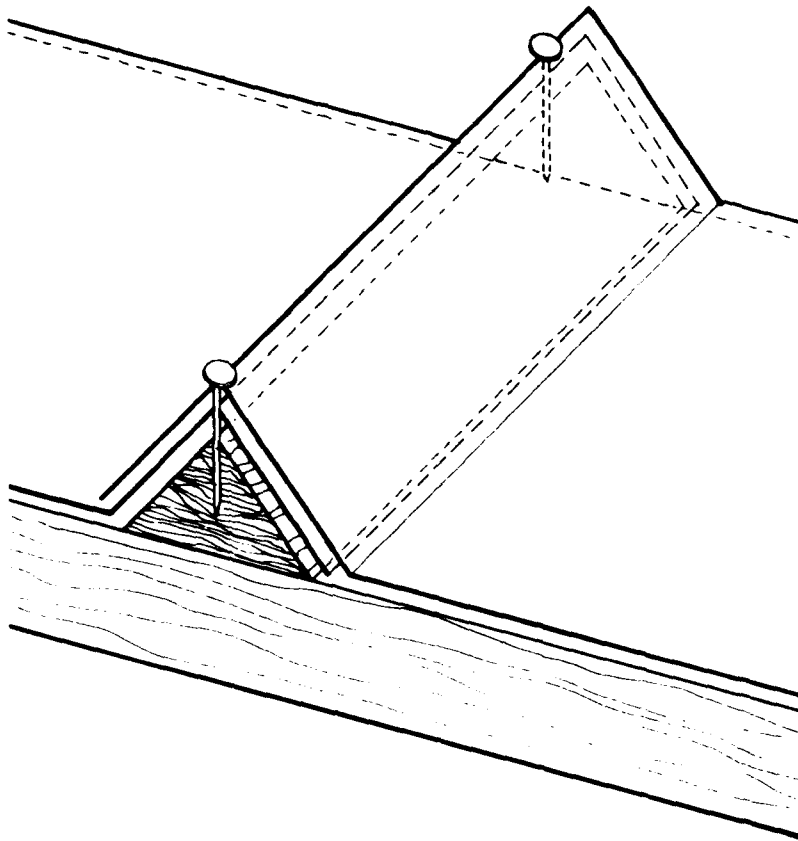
Seam detail on machine-formed panel- inverted V Type.
